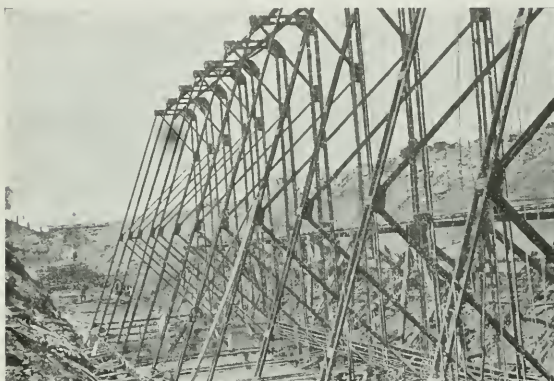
End Section of Steel Frame for West Entrance Wall at Port Weller, Before Placing Reinforcing Steel.
